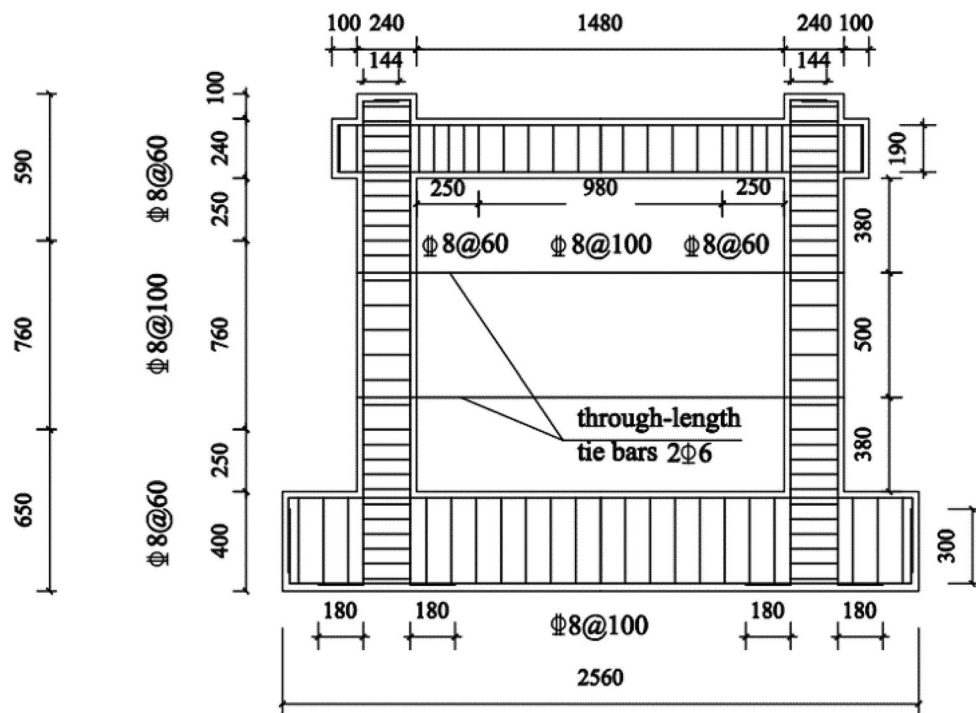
Reinforcement of cast-in-place frame print concrete wall component (mm)
